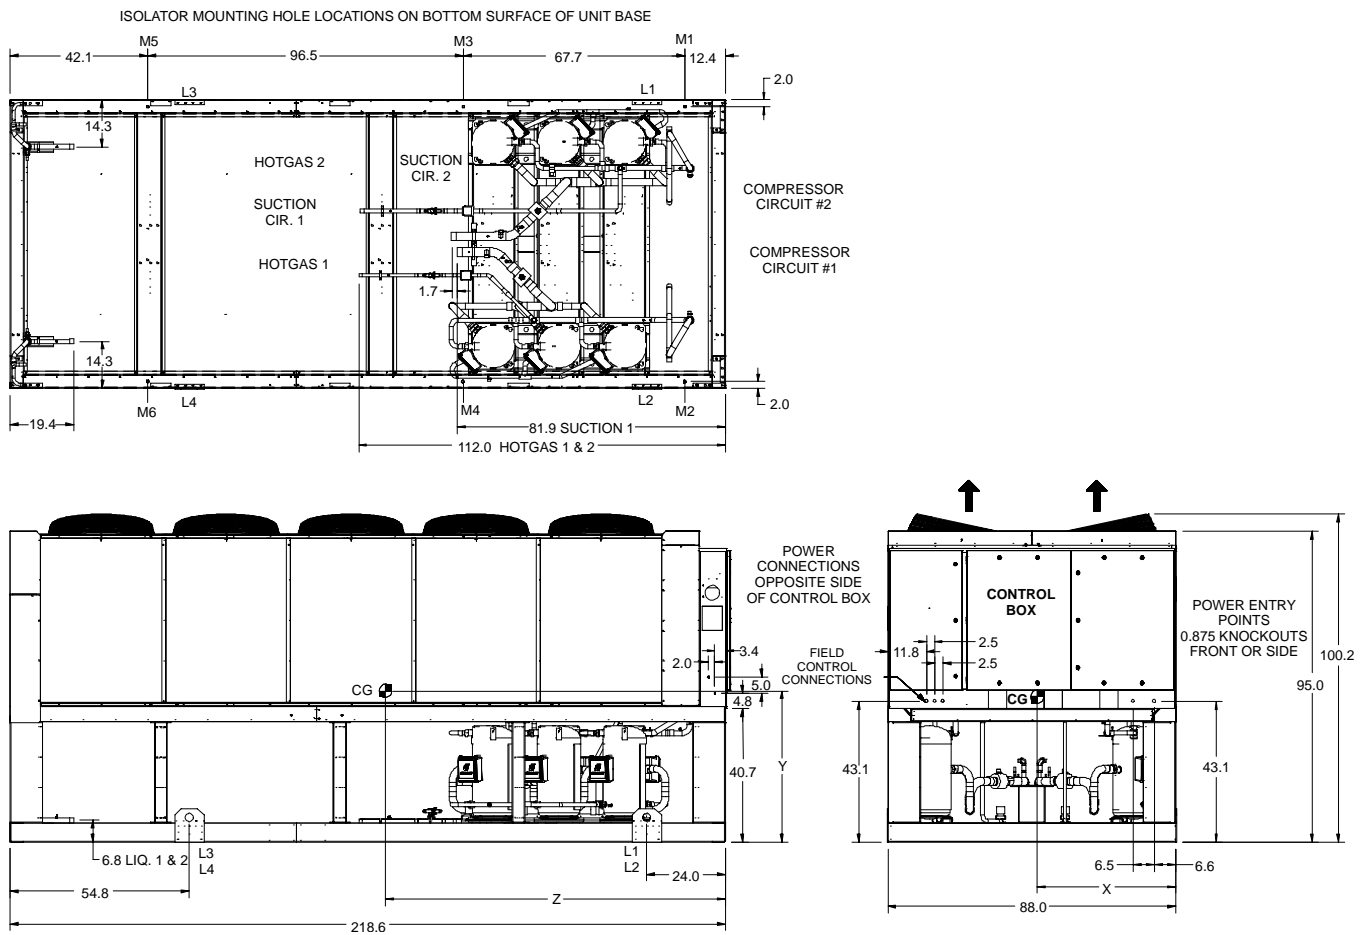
, Dimensions, AGZ 100CB – 130CB, w/Remote Evaporator
